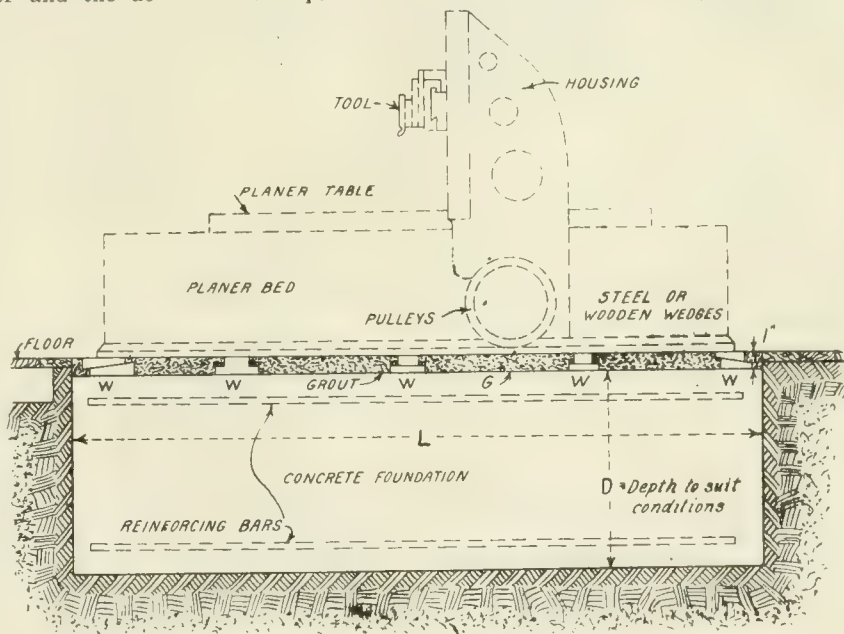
GROUT BEDDING UNDER A PLANNER.
